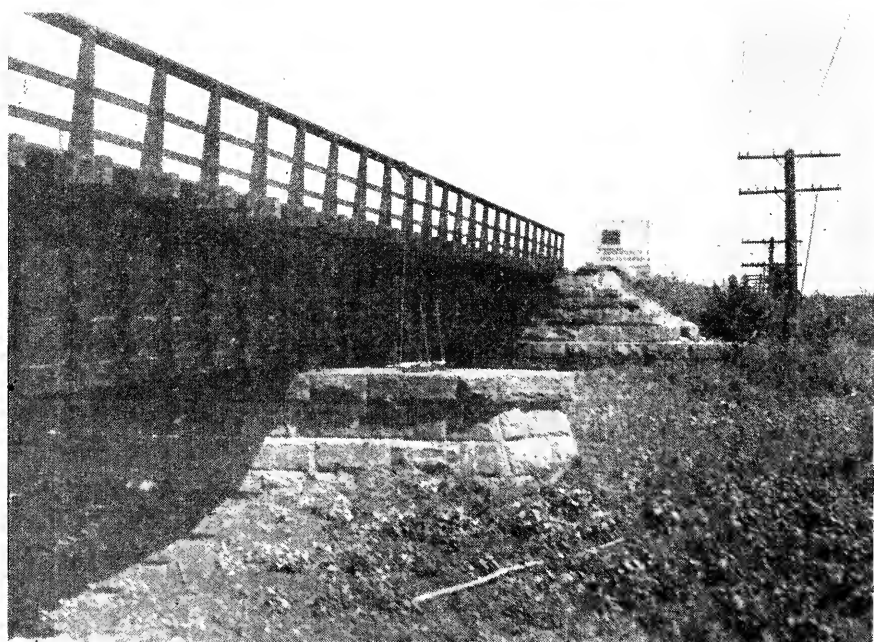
General views of 71-ft. 10-in. deck girder span near Rochelle, Ill.
